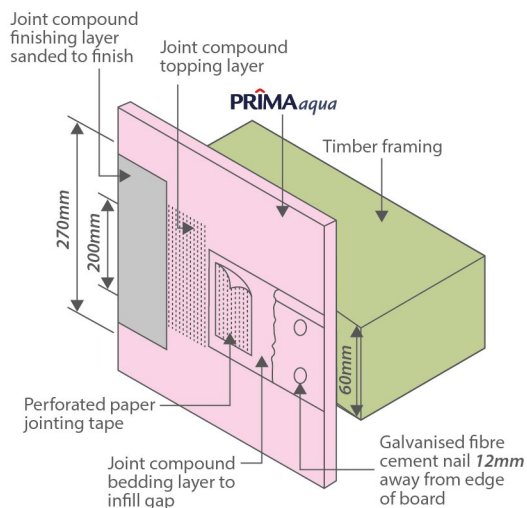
Flush Joint Detail (Untiled Wall and Ceiling)
